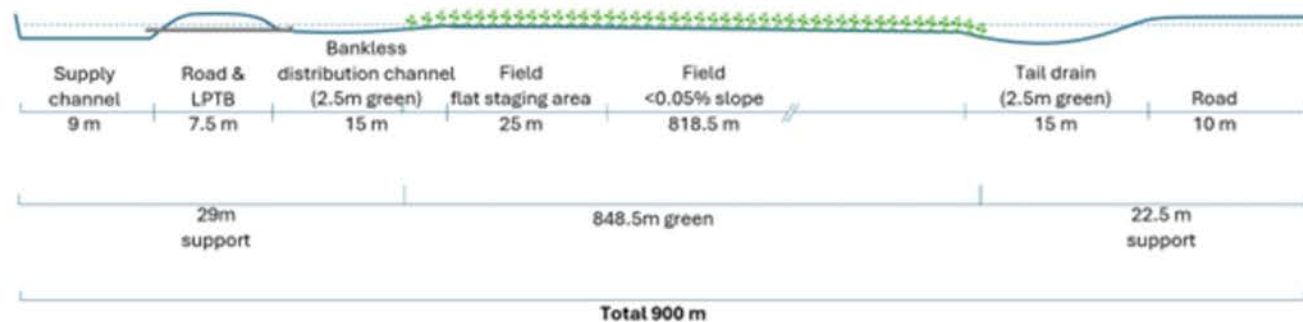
Longitudinal cross section - Pontoon and large pipe through bank
